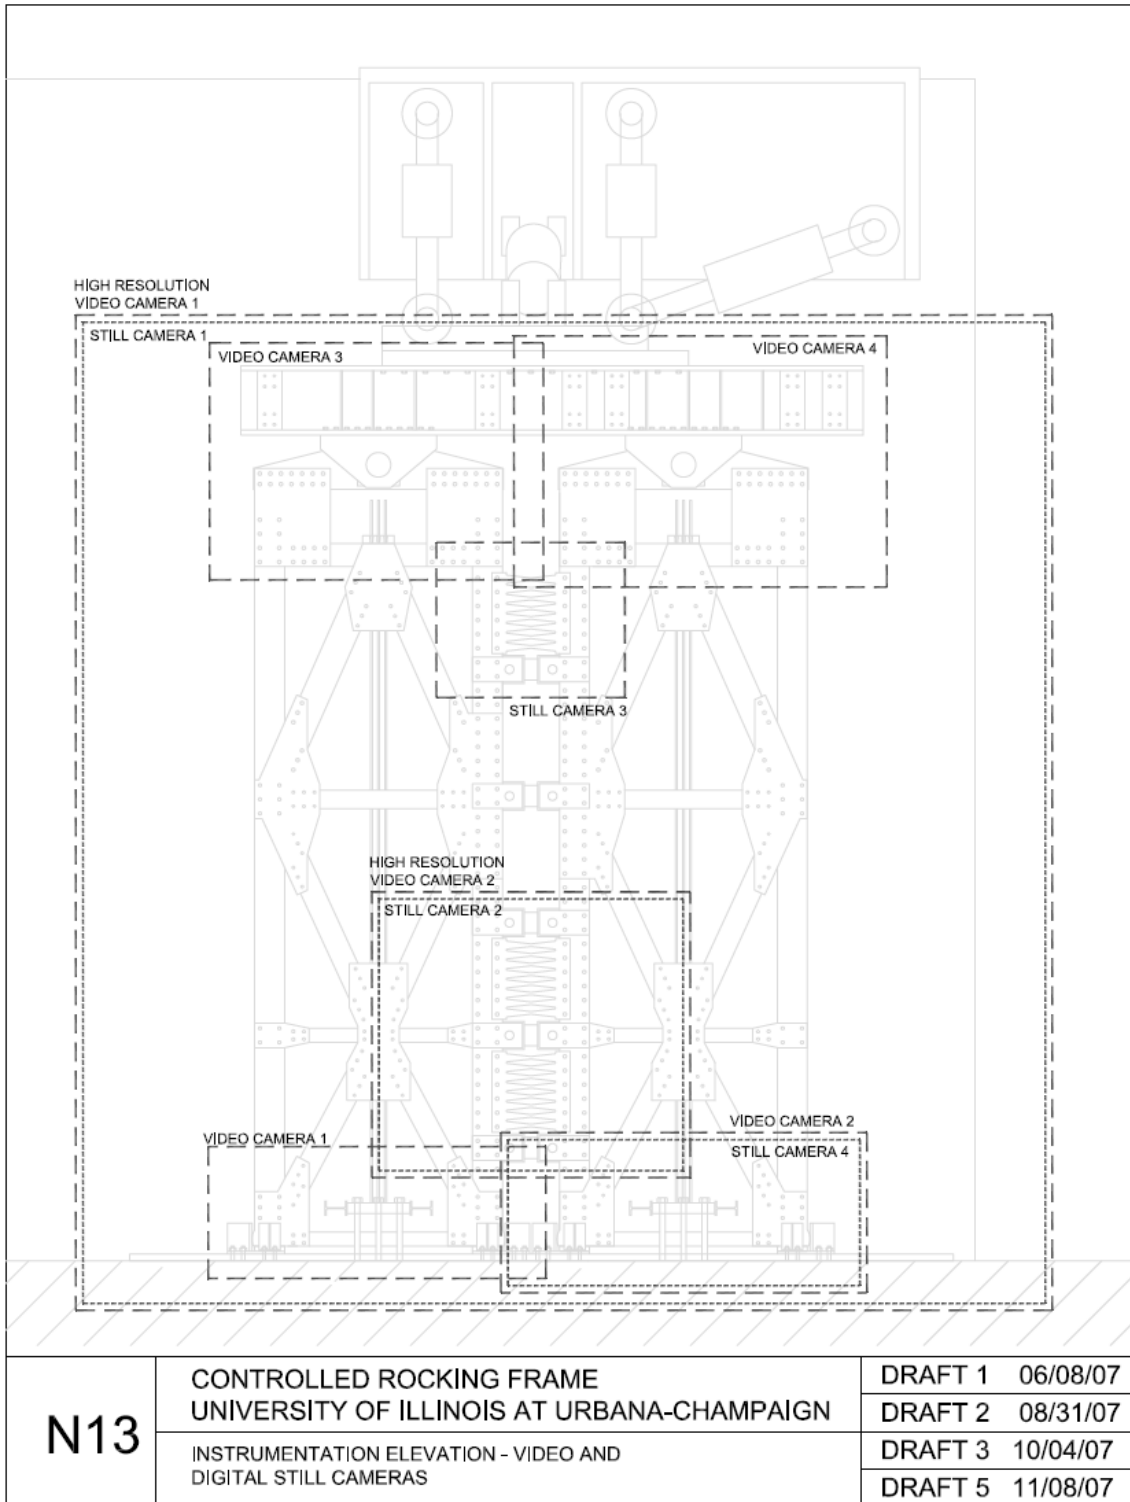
Instrumentation Plan Drawing – Video and Digital Still Plan
